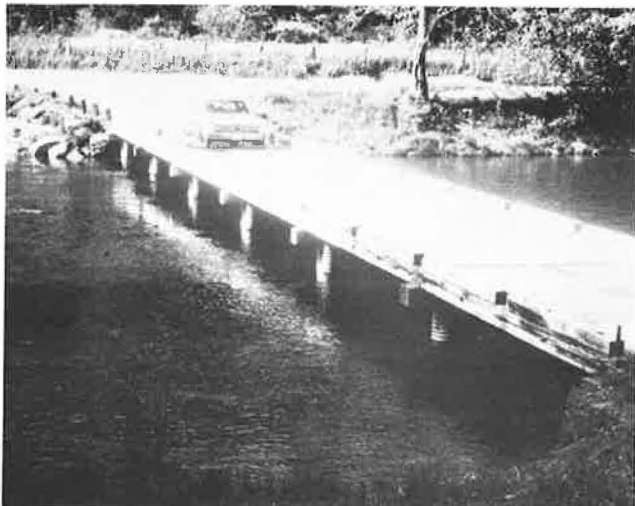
(c), 7 and 8 show examples of low water bridges constructed of concrete and concrete with wood decks. These structures can include 10-45 m (30 - 150 ft.) crossings, and spans of 5-10 m (14-30 ft.). Cutoff walls and/or riprap should be carried above the 50 year storm level where practical. Where this may be impractical due to the low approaches to the crossings, cutoff walls should be carried around the ends of the structures to protect the structure itself.
